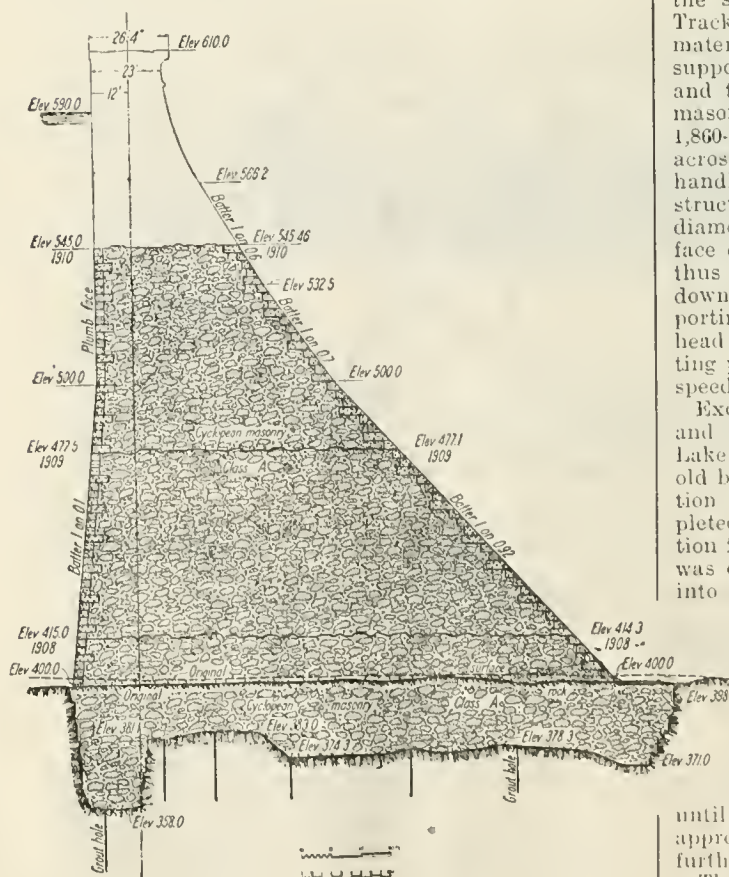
OLIVE BRIDGE DAM: PROGRESS IN LAYING MASONRY TO JANUARY, 1911.
